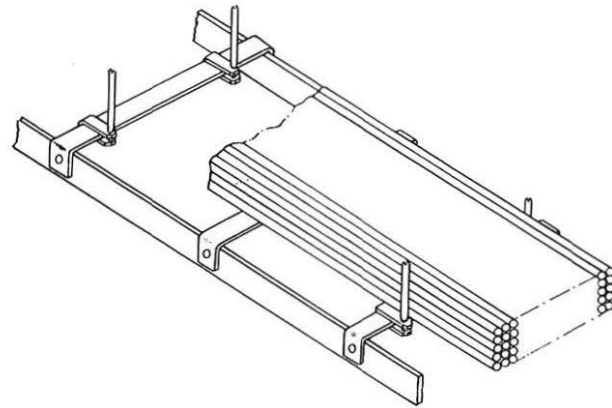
USE OF CABLE PINS WITH RECTANGULAR CROSS-SECTIONAL CABLE RACKING
